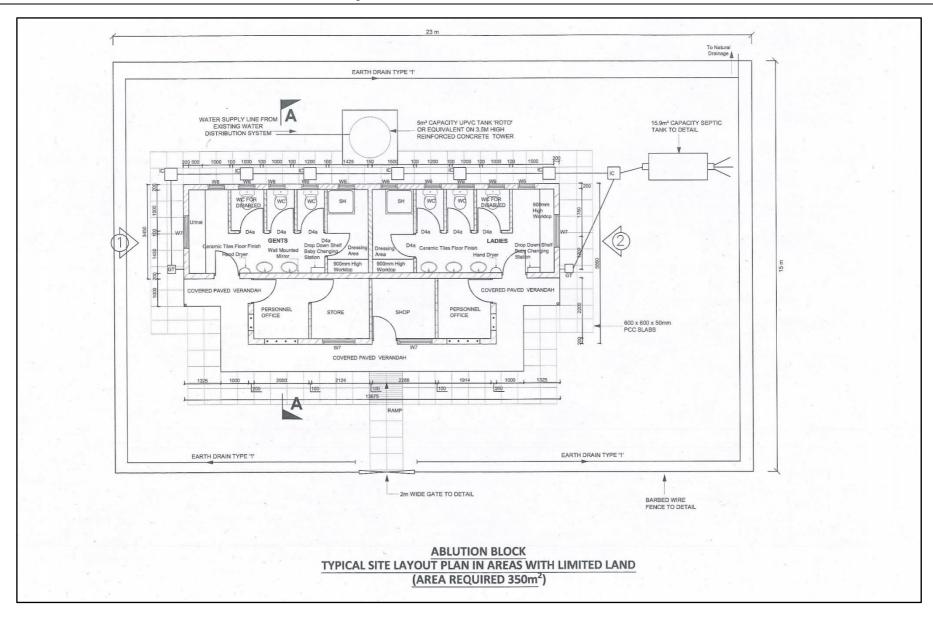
Typical Site Layout Plan for an Ablution Block
